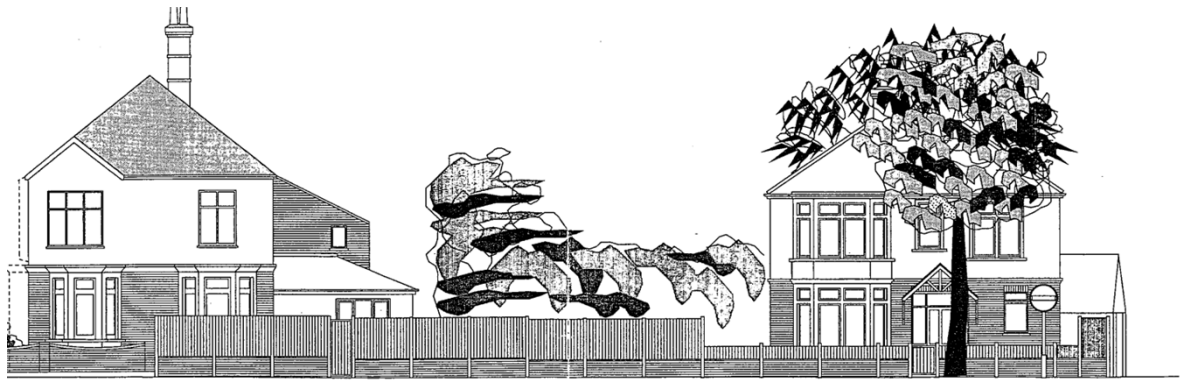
Proposal for a two storey house refused and dismissed on appeal under application ref: 2002/0337 (020844)
